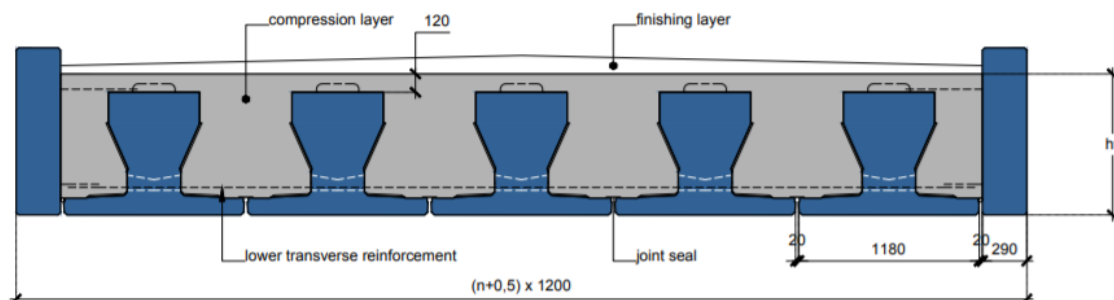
Cross-section of a solid infilled beam (SJPFlex) deck [72]
